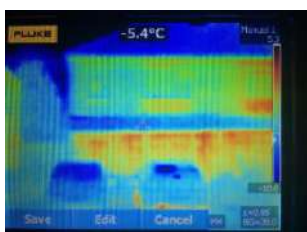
shows the outside of a semi-detached house with no heat escaping through the roof - a suitable level of insulation has been installed throughout the roof.
